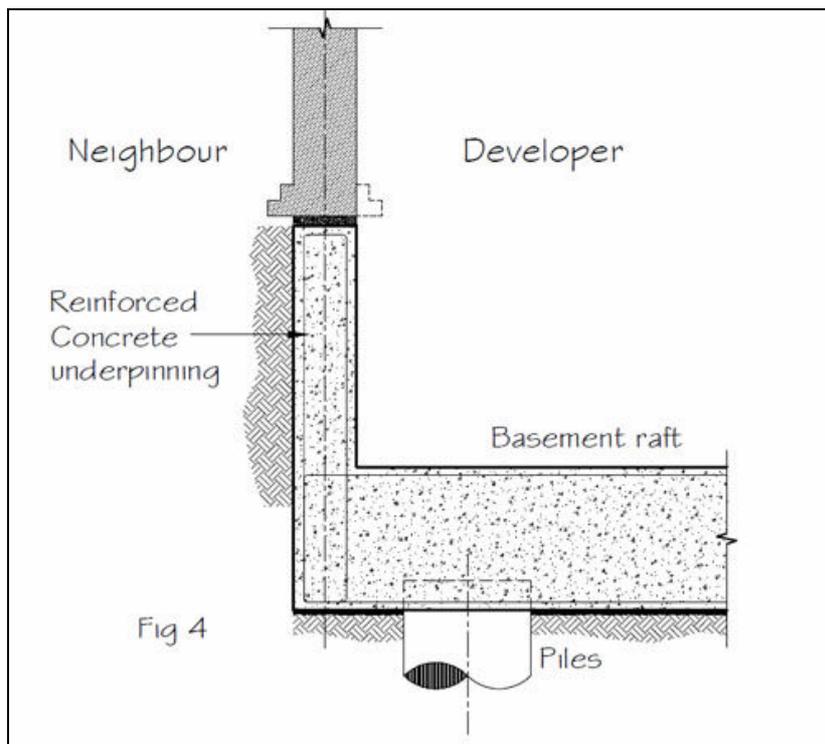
2010's: Substantial superstructures often include piles and more substantial raft foundations.
